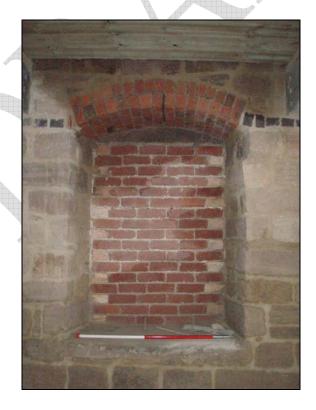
Photograph of an infilled window on the north-east façade of the mill which abuts the boiler house (facing north-east) (scale = 1m).
